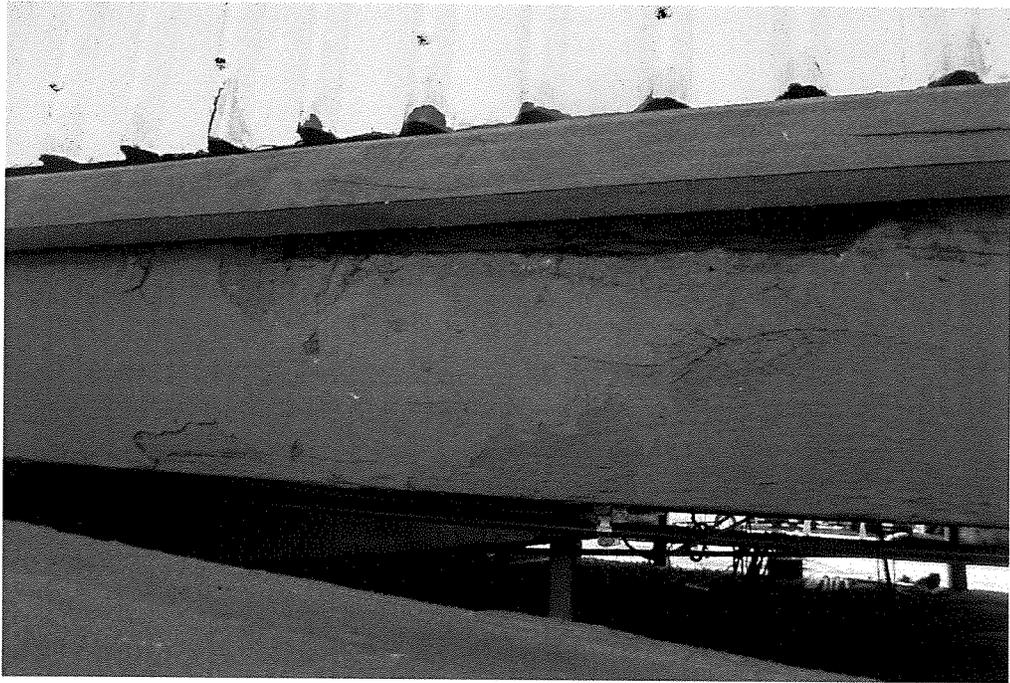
Deteriorated Fascia Behind Trim (Repair per sheet S-10)
